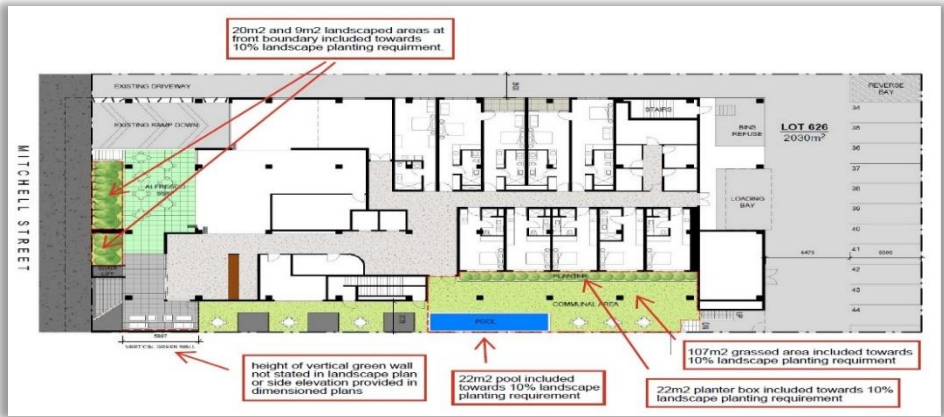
ground floor landscaped areas included and not included toward 10% landscape planting requirement.
